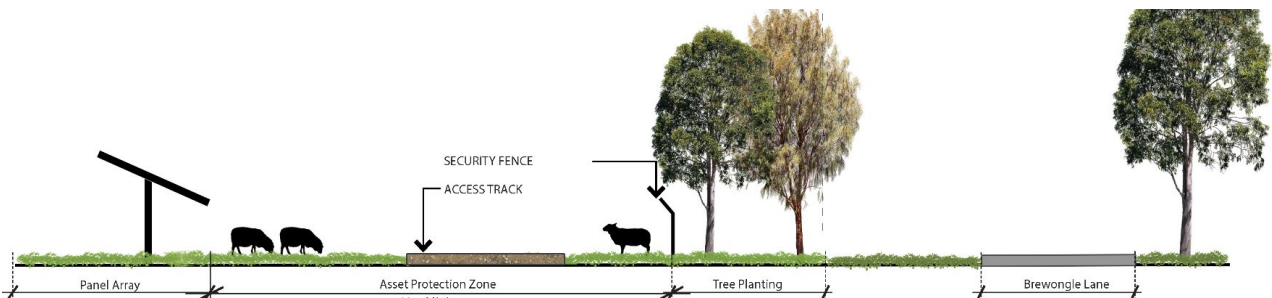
Landscape Concept Plan linear tree planting proposed
